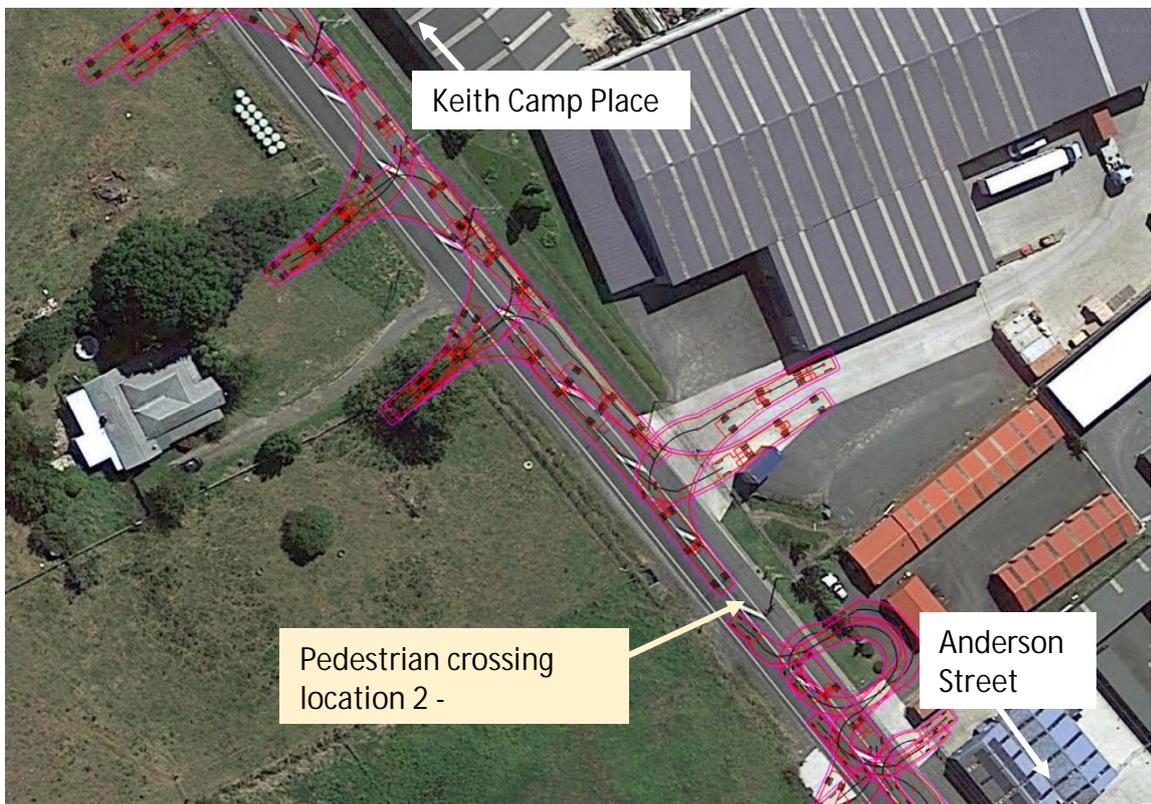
Avenue Road North pedestrian assessment – Keith Camp Place to Anderson Street
